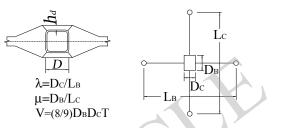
Construction of outer ring plate enhanced joints (Tabuchi, M.1988).
